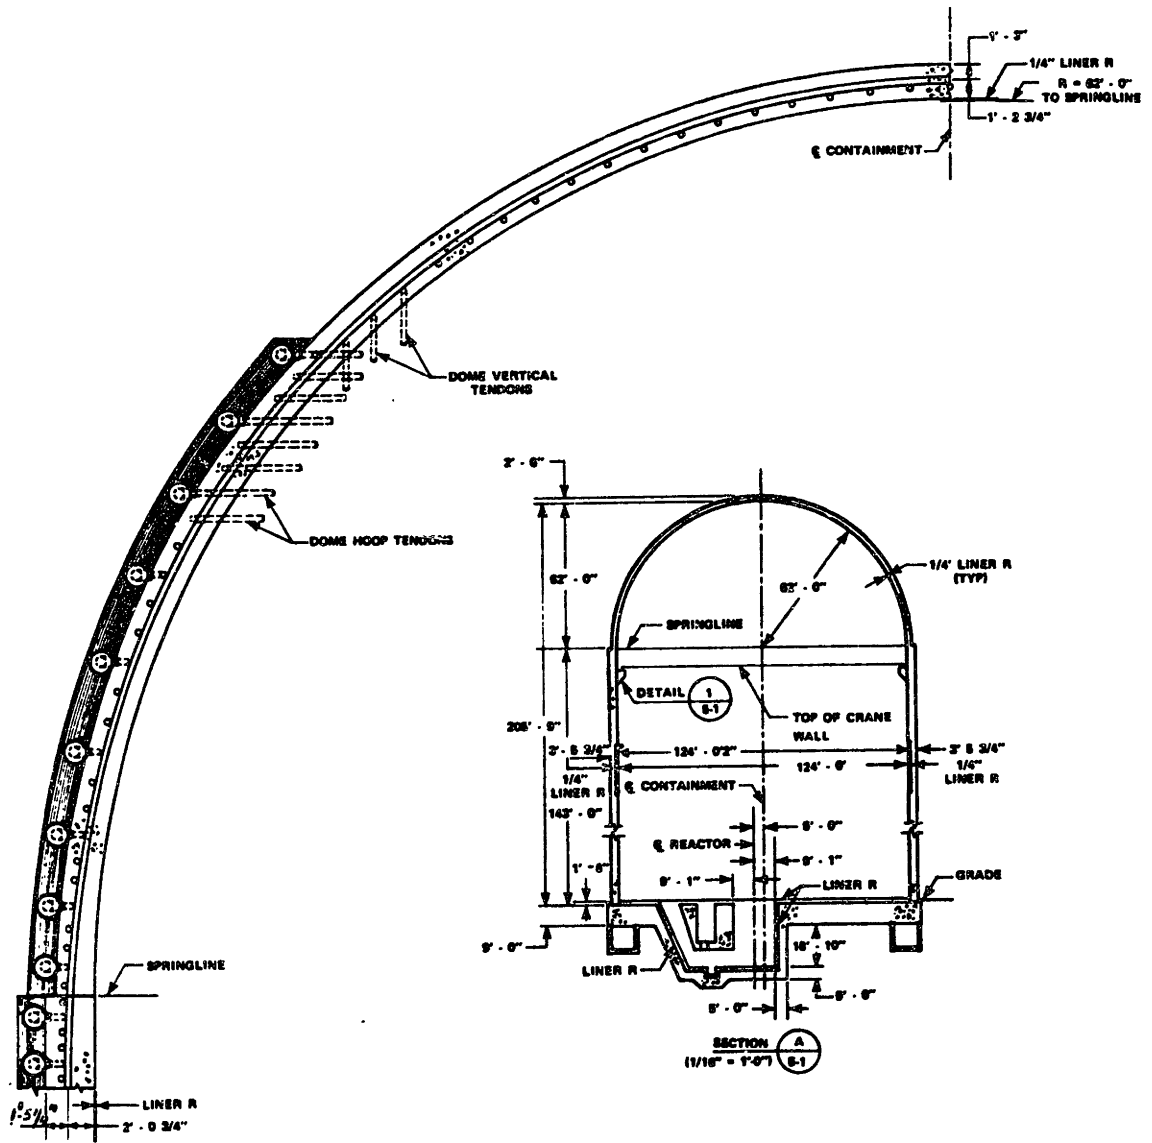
CONTAINMENT CONSTRUCTION OF A STATIONARY PWR PLANT
